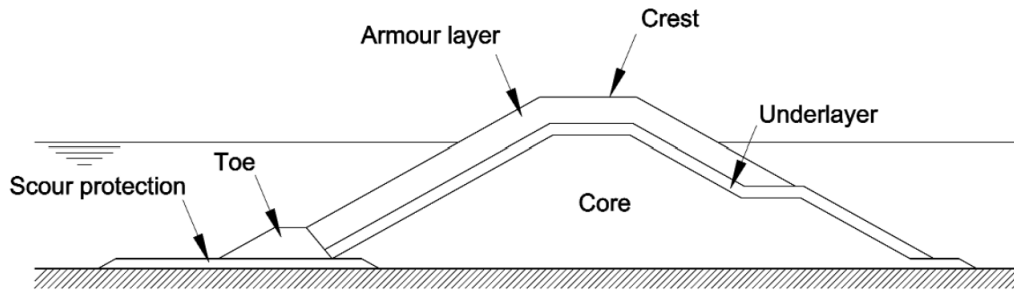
Cross-section of a typical rubble mounted breakwater (*The Rock Manual, 2007*).
